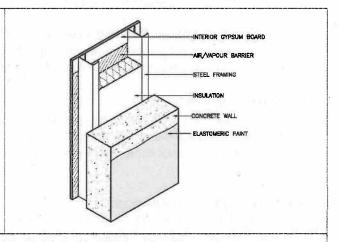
Structural Concrete with Steel Stud Wall Assembly
